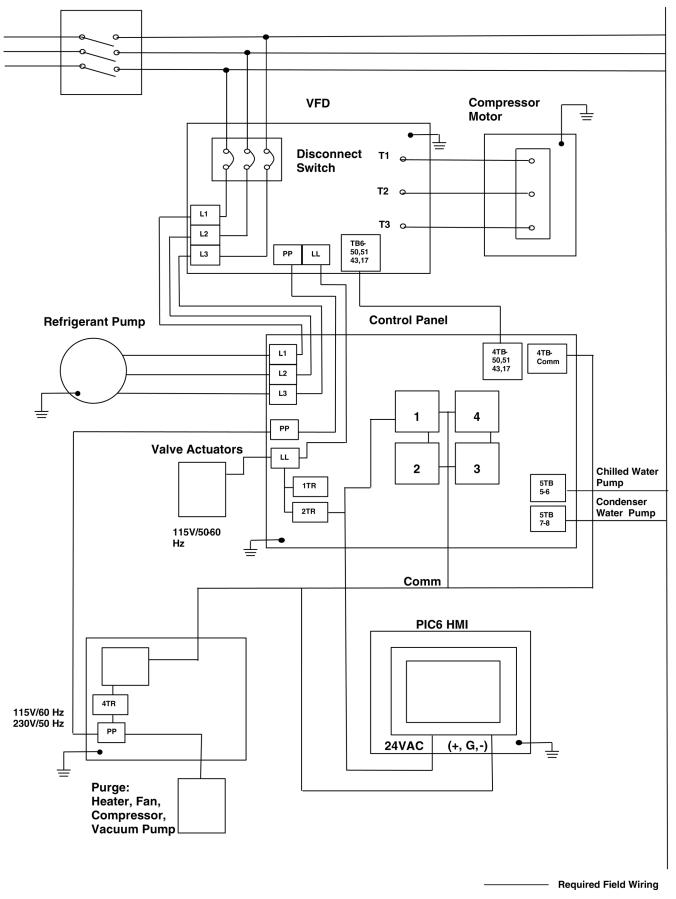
Typical 19DV VFD — Factory Unit Mounted
